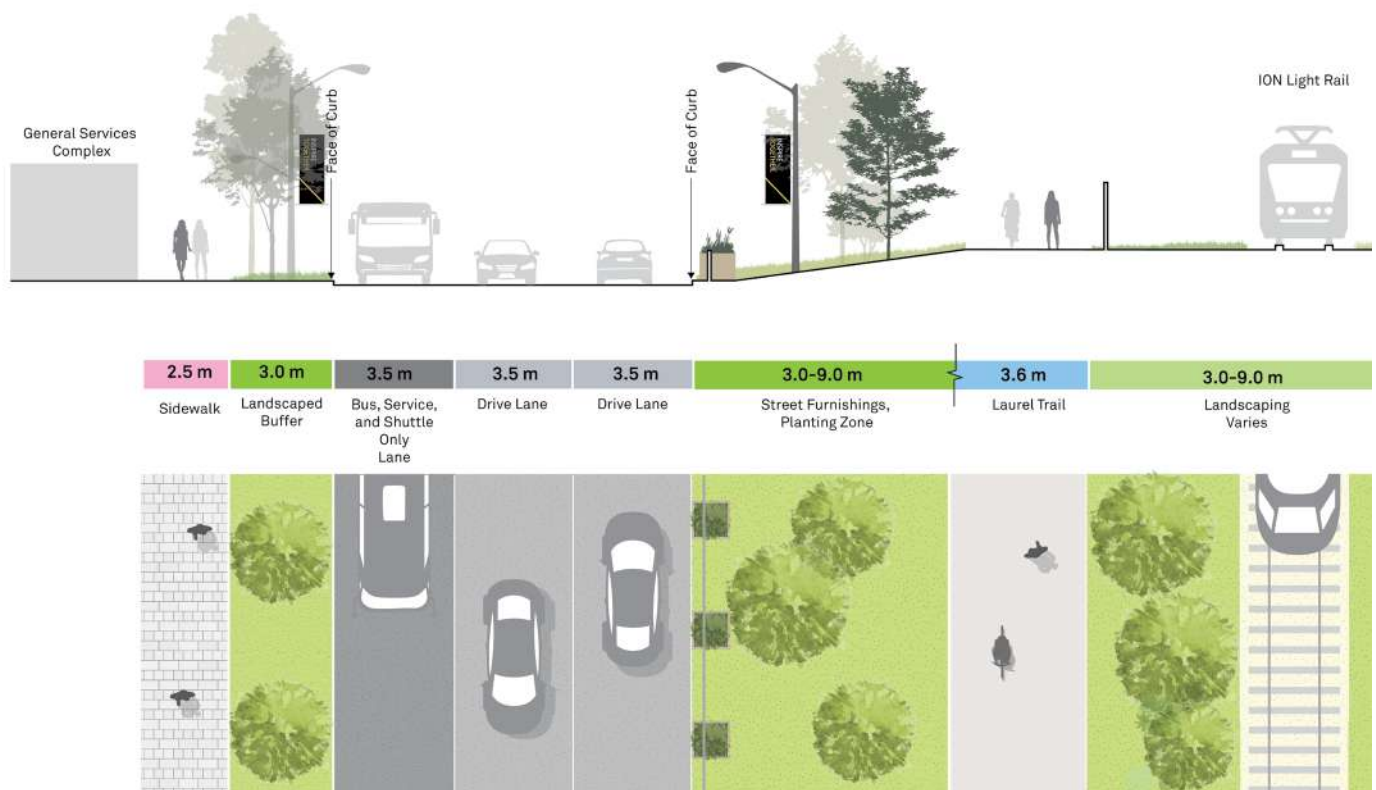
Section C. Proposed condition of Ring Road (northeast edge from Hagey Blvd to William Tutte Way).
